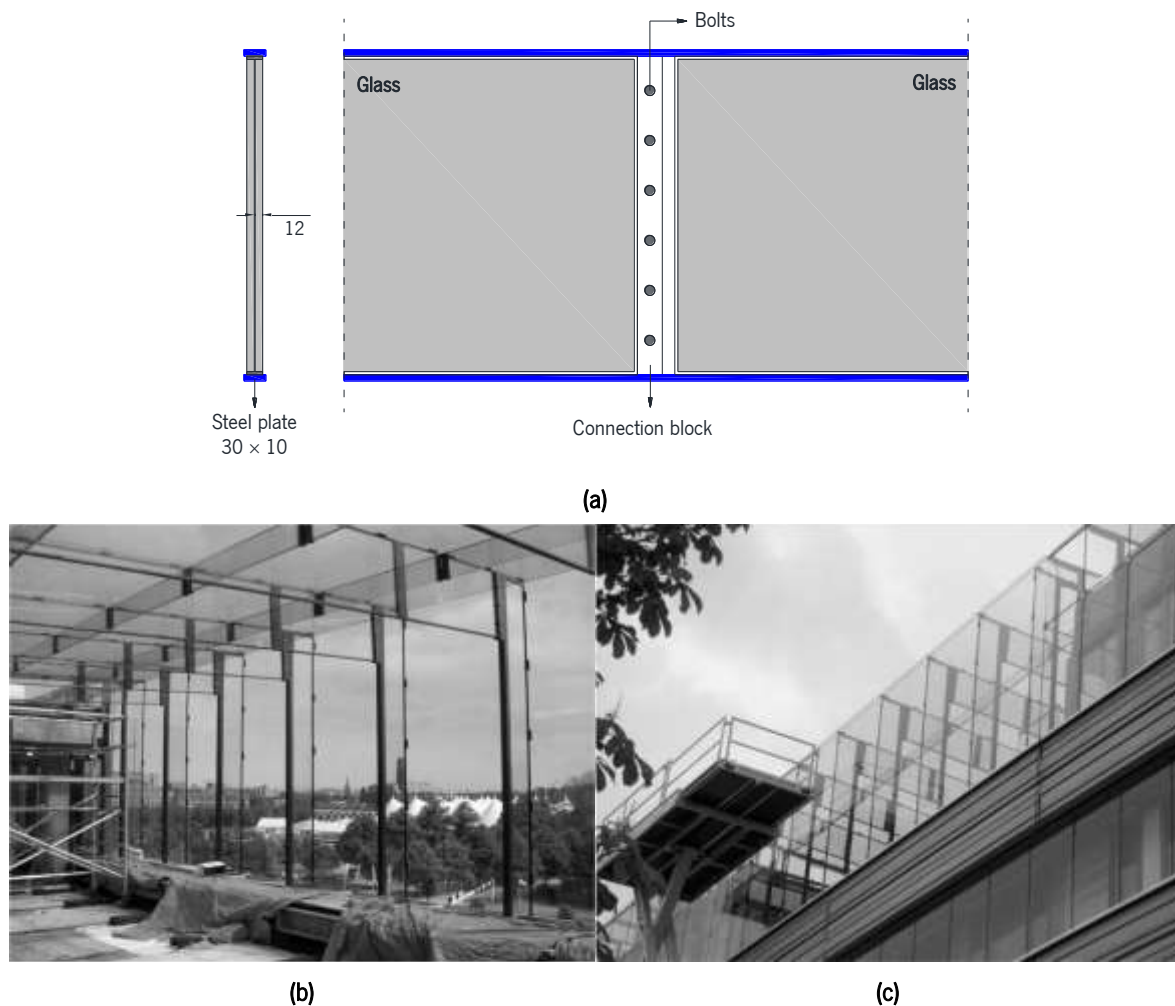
Steel-framed glass beam developed by Belis *et al.* [5]: (a) cross-section-geometry and schematic representation of the connection between beam segments; and (b-c) Dutch Ministry of Finance in The Hague. Note: units in [mm].
